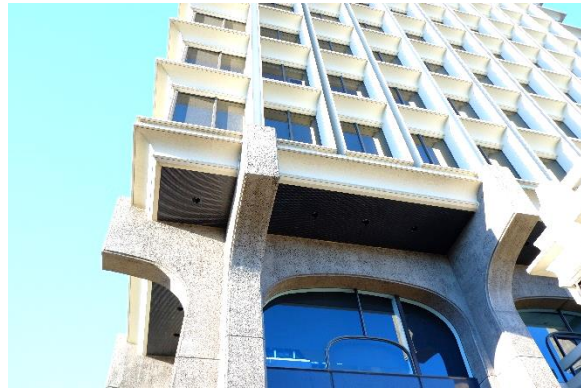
Curved portion of the columns, supporting the cantilevered shaft of the office tower.
